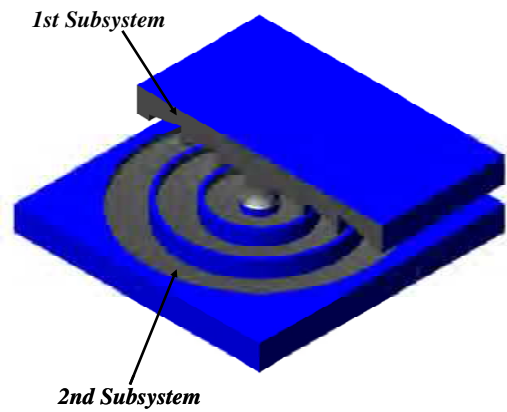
(g). Exploded view of MFPS isolator with six sliding surfaces
